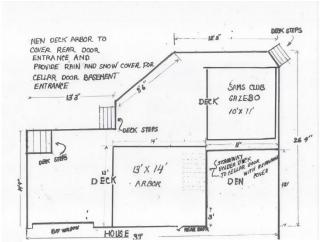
, by Applicant: Proposed installation of the deck, gazebo and arbor.
